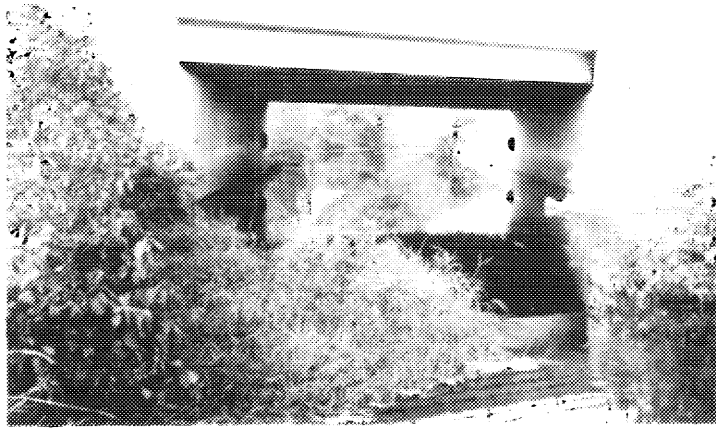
View of Spring Street bridge looking upstream. Note heavy growth on banks, particularly upstream of bridge.
